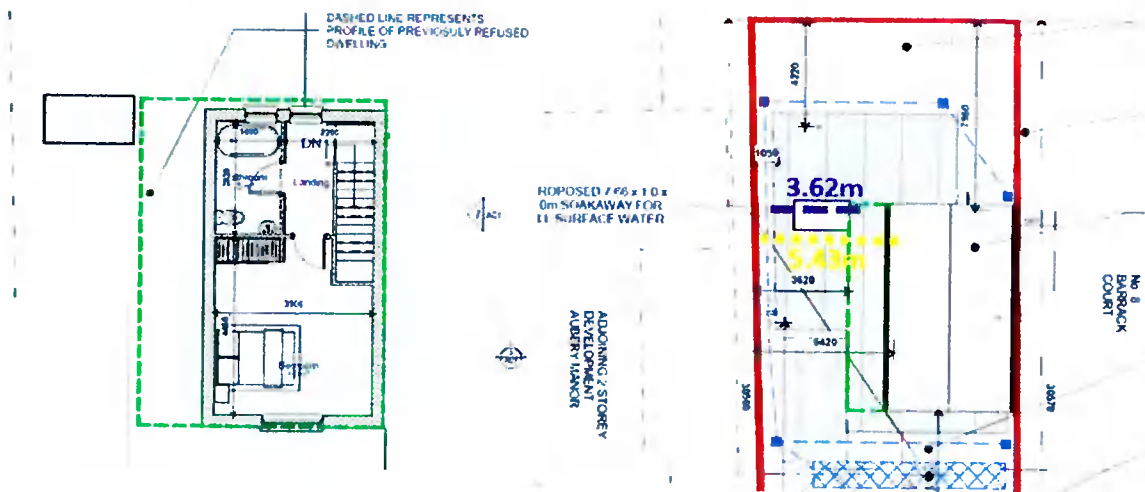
Currently proposed first floor plan (l) and proposed site layout plan (r). The black dashed line on the currently proposed first floor plan indicates the outline of the first floor plan as refused under Reg. Ref. SD19A/0128, whilst the purple and yellow dashed lines indicate the separation distance between the first floor level and the western site boundary both as per Reg. Ref. SD19A/0128 and as currently proposed.
